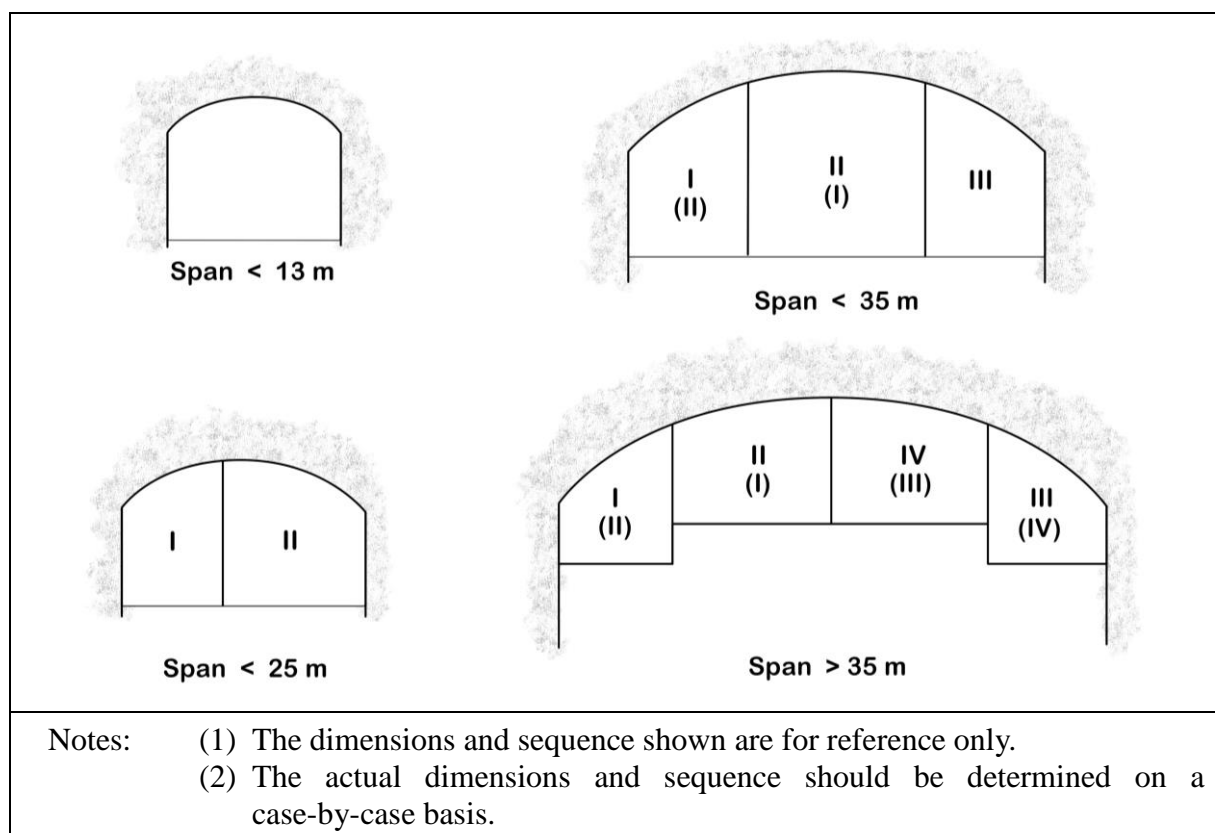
Typical Excavation Stages for Top Headings in Caverns
